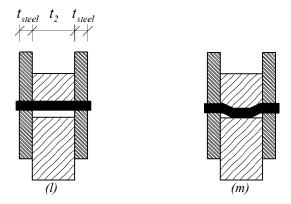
Failure modes in double shear with thick plates as outer members
